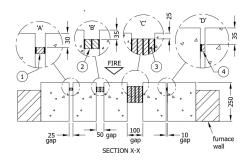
Cross-section of wall linear gap systems H1-H4 – assessment 3 (as shown in WF 157402) – dimensions in mm
